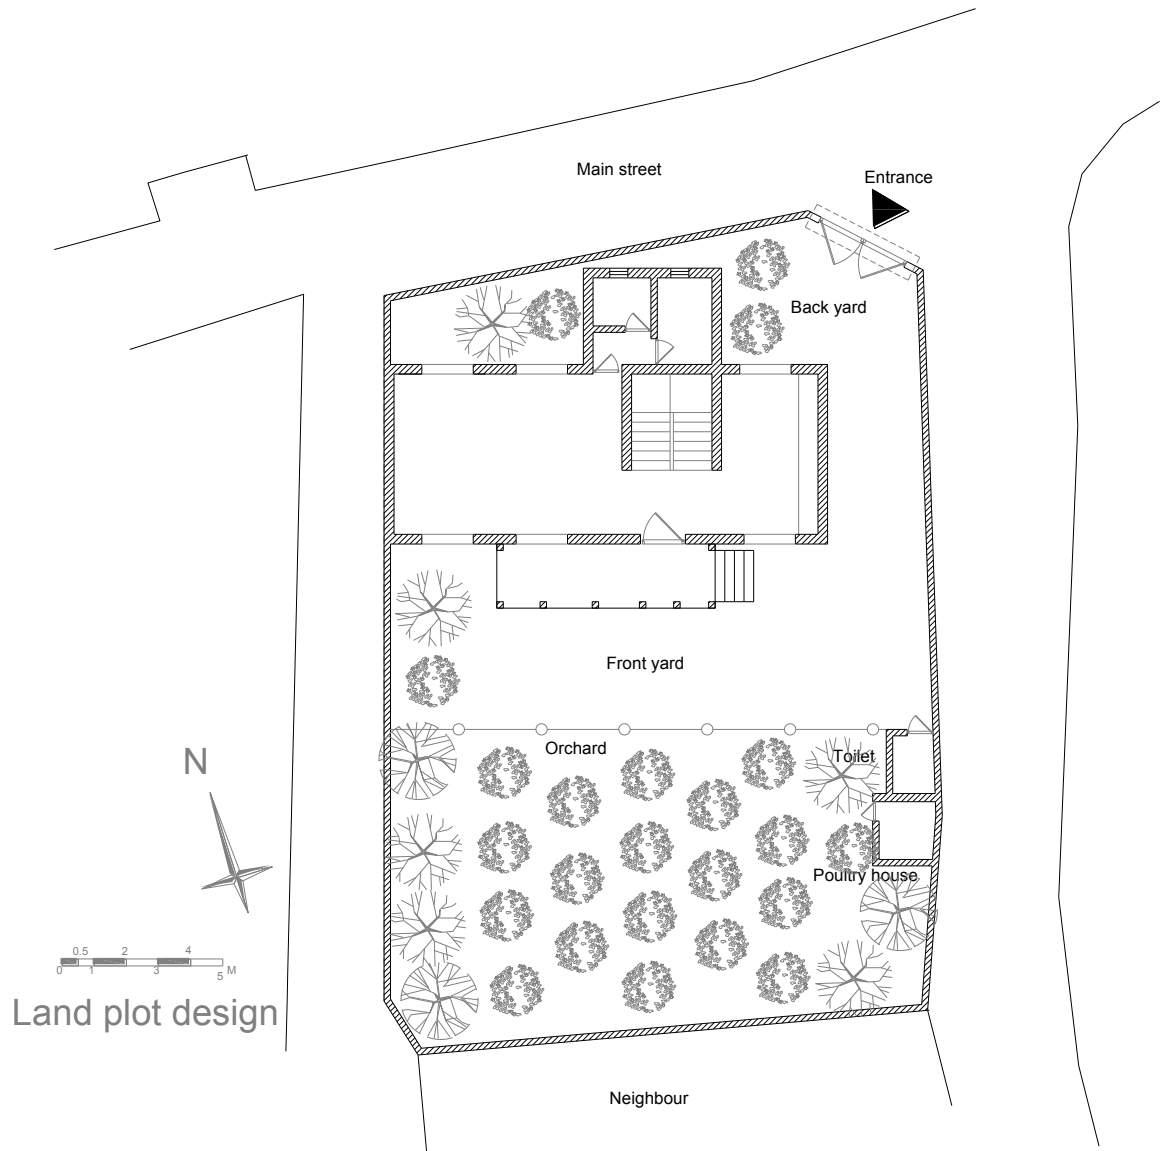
land plot design of the new house in Diva defining the location of the house, outbuildings, entrance into the land, and location of open spaces.
